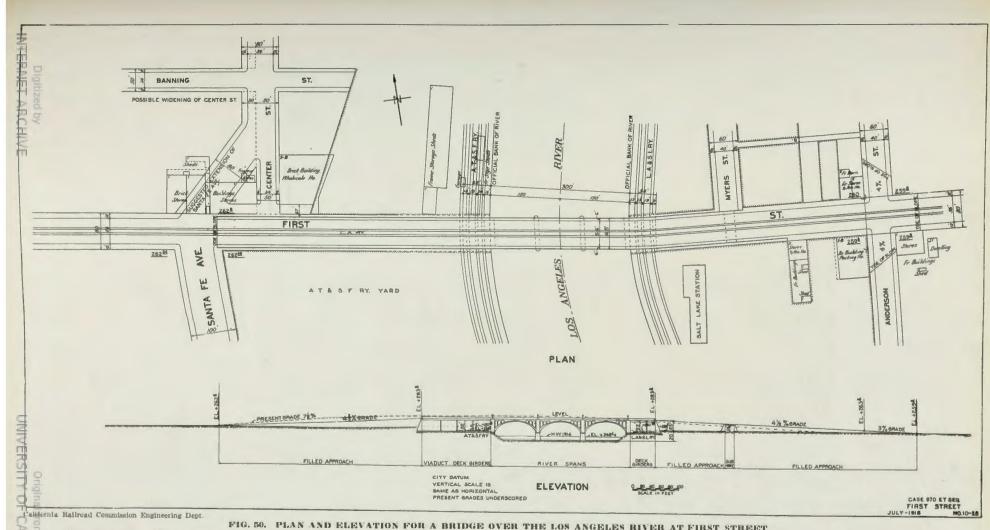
PLAN AND ELEVATION FOR A BRIDGE OVER THE LOS ANGELES RIVER AT FIRST STREET
